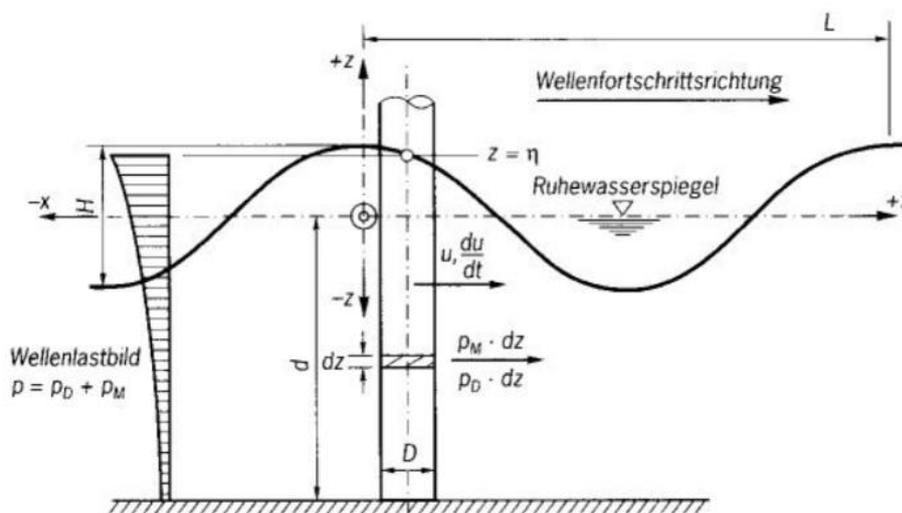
Wave action on a slender structure according to figure 4.11 EAU ref [7]
